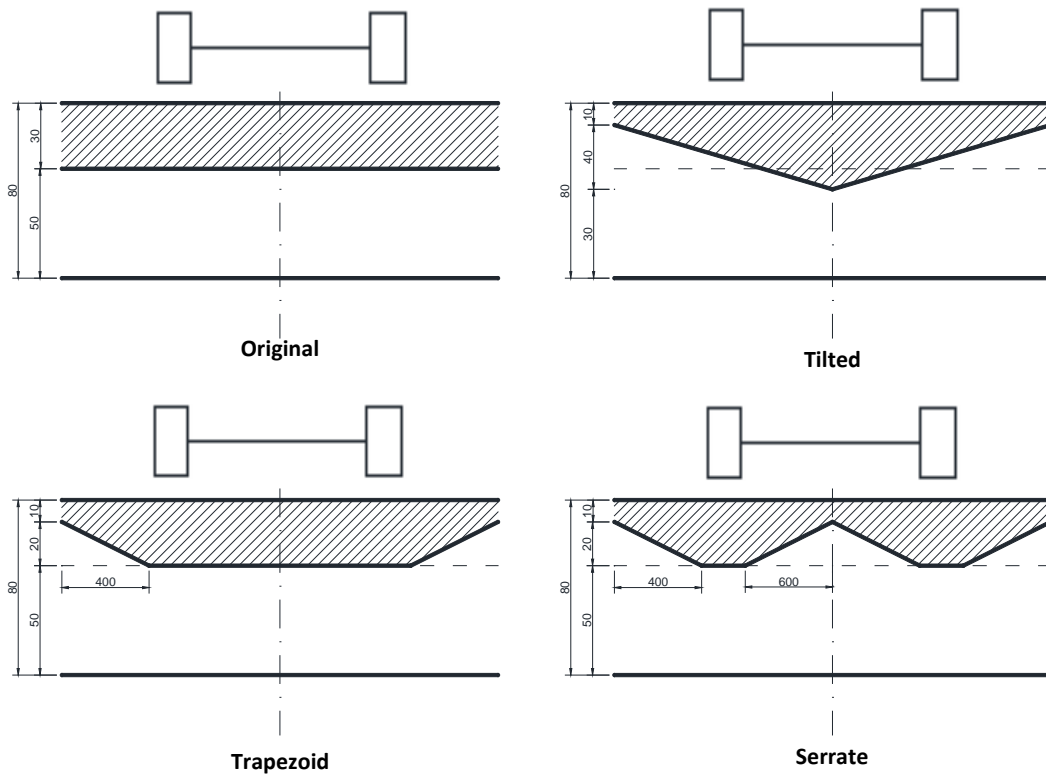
Other proposed designs for the asphalt pavement structure (single lane, mm)
